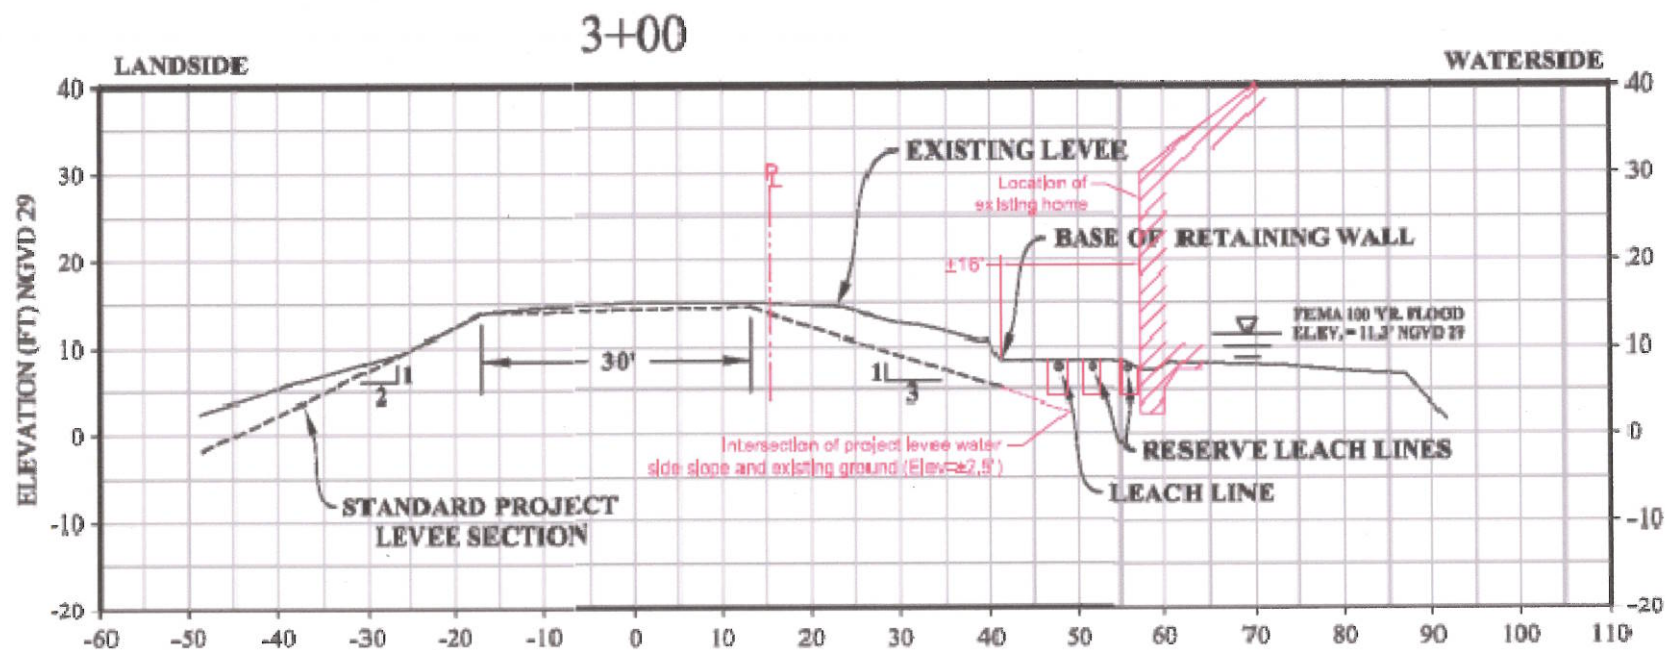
Site Cross Section added labels by CVFPB (source: MBK Engineers Cross Sections, Sheet 3 of 3, dated 12/9/2010)
